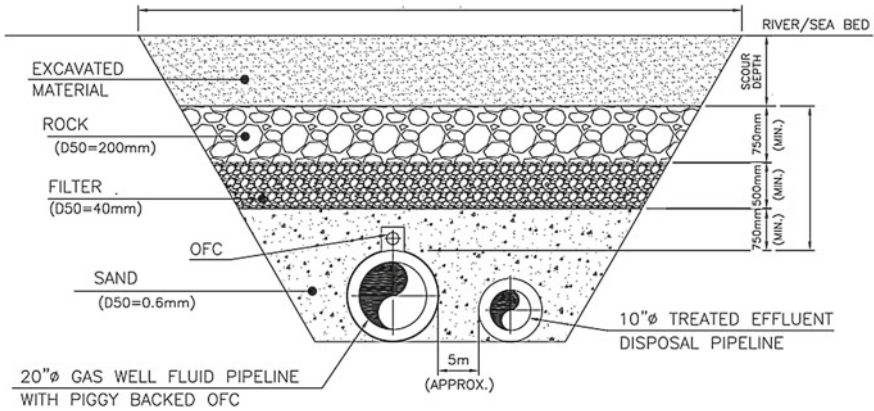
Typical subsea pipeline trenching detail of 20" proposed pipeline from KP9.5 to KP21.5
